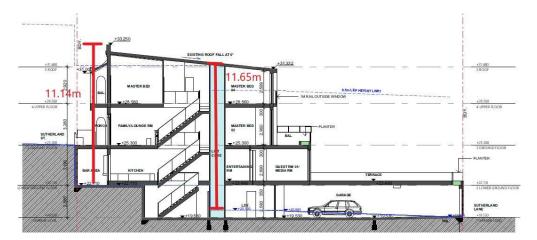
Section A-A demonstrating existing and proposed maximum heights
